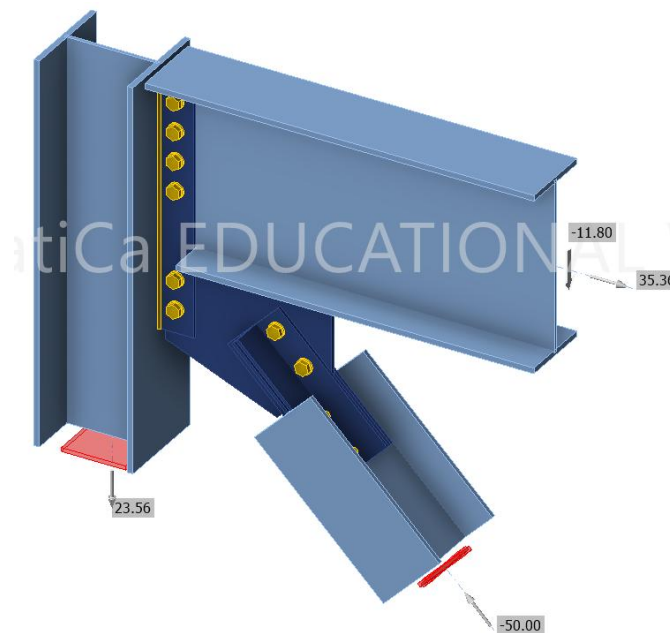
Workflow of connection from SAP2000 to IDEA StatiCa (IDEA StatiCa, n.d.)
